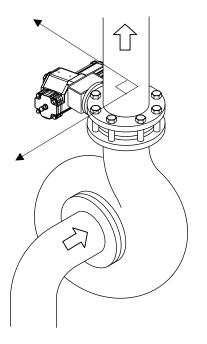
Installing the butterfly valve after a centrifugal pump
